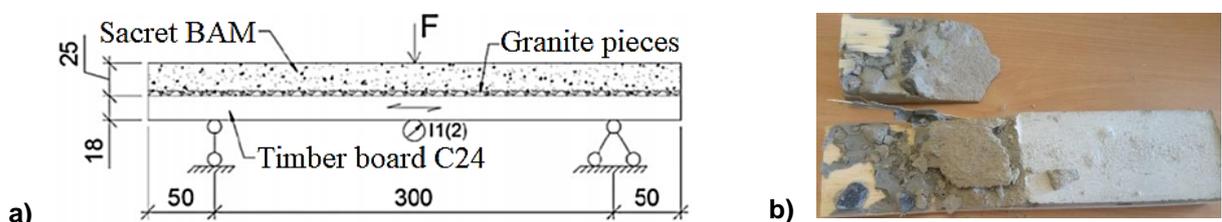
Testing of timber-concrete composite specimens: (a) scheme of the specimens testing; (b) failure mode of the specimen with the rigid timber to concrete joint and granite pieces dimensions changing within the limits from 16 to 25 mm [19]
